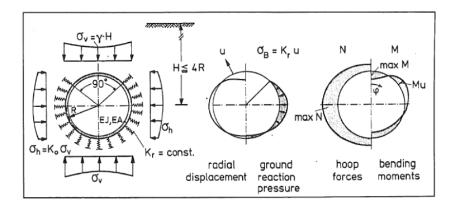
Bedded Beam Model for Shallow Tunnels (picture by Minh V.)
